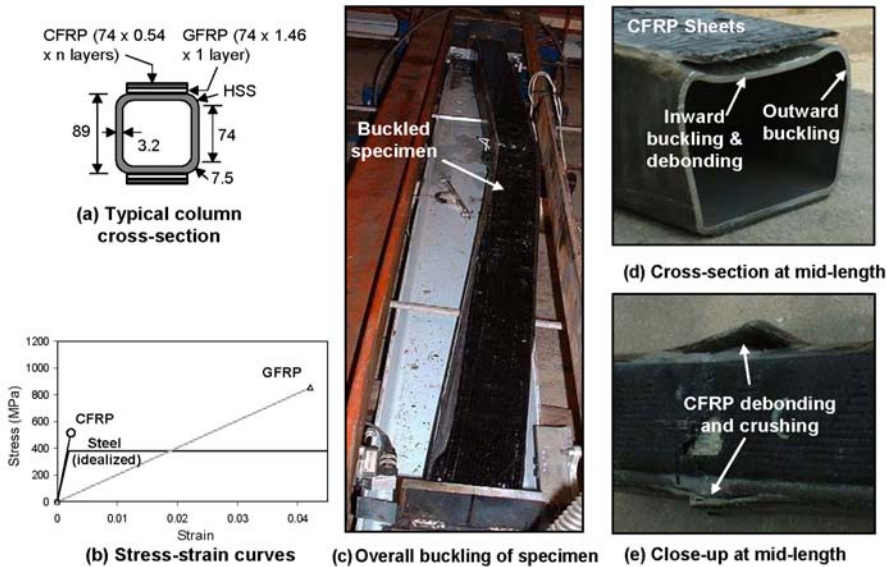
Specimen cross-section, materials, test setup and failure mode
